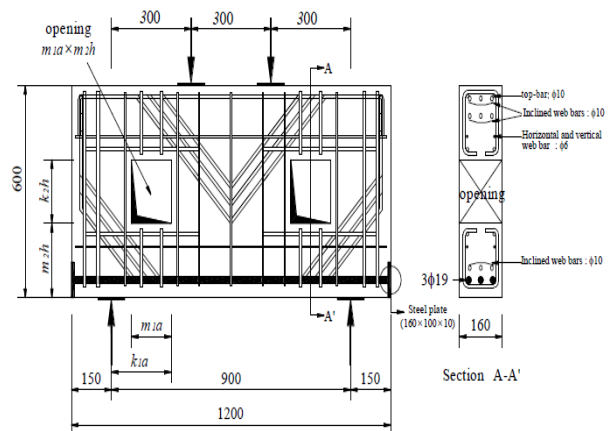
Specimen details and arrangement of reinforcement (all dimensions are in mm) [10].
